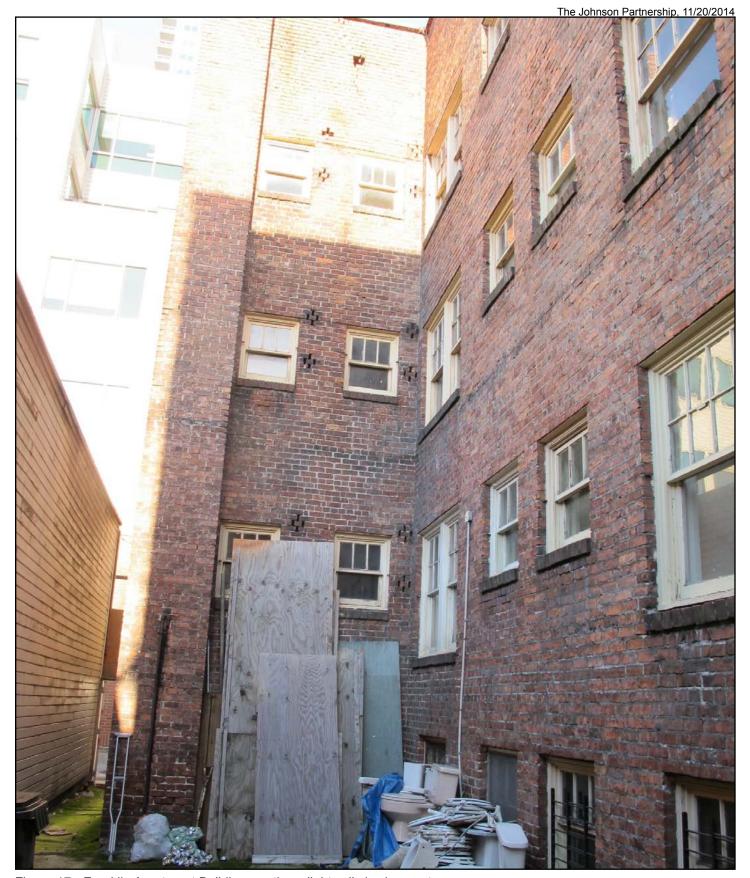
• Franklin Apartment Building, northern lightwell viewing east
